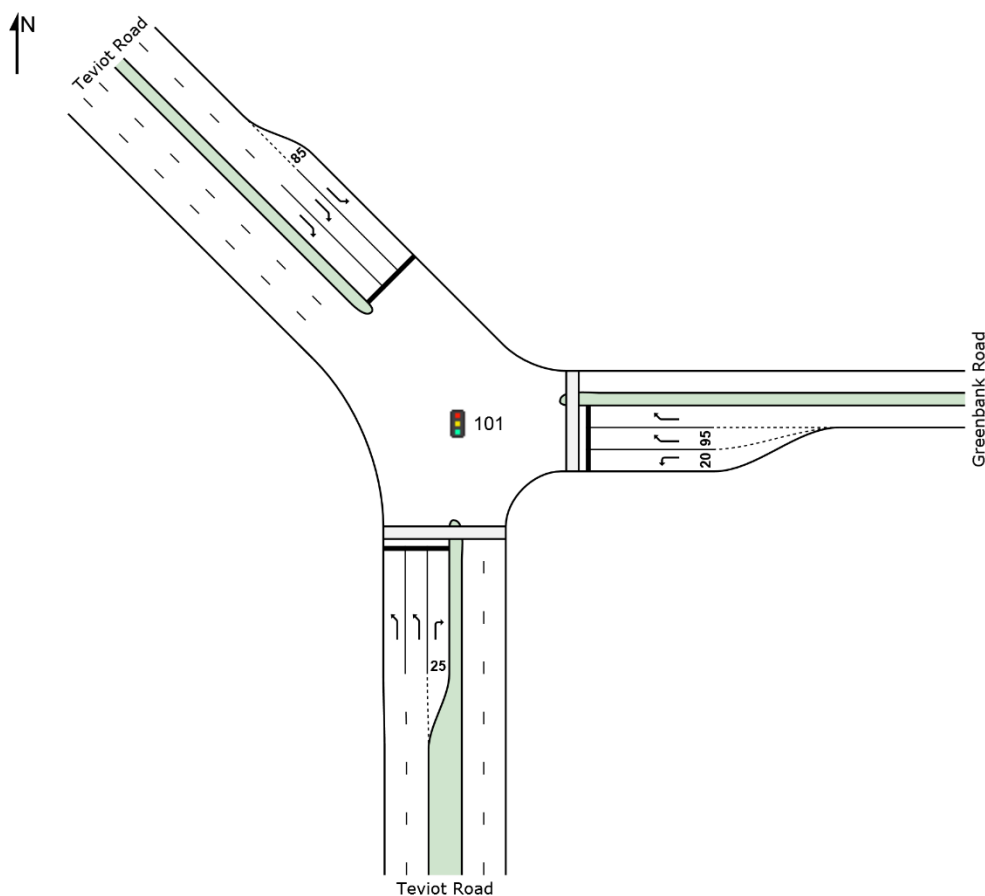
Teviot Road /Greenbank Intersection Layout
